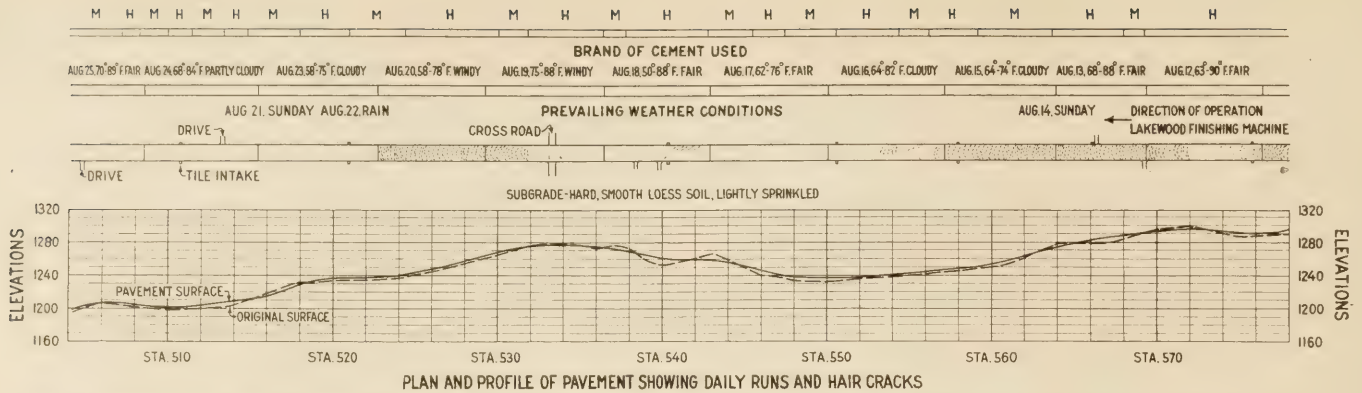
Typical section of first concrete pavement laid on loess soil of western Iowa. Hair cracking is most prevalent on portion of the pavement laid downhill
